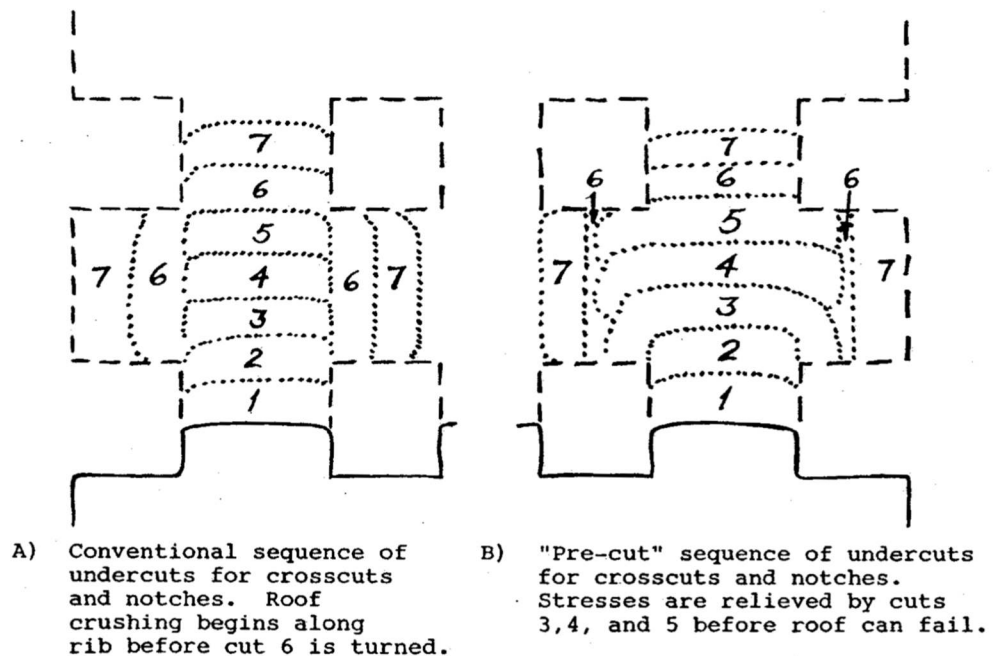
Plan showing method of "Pre-cutting" crosscuts and notches.
